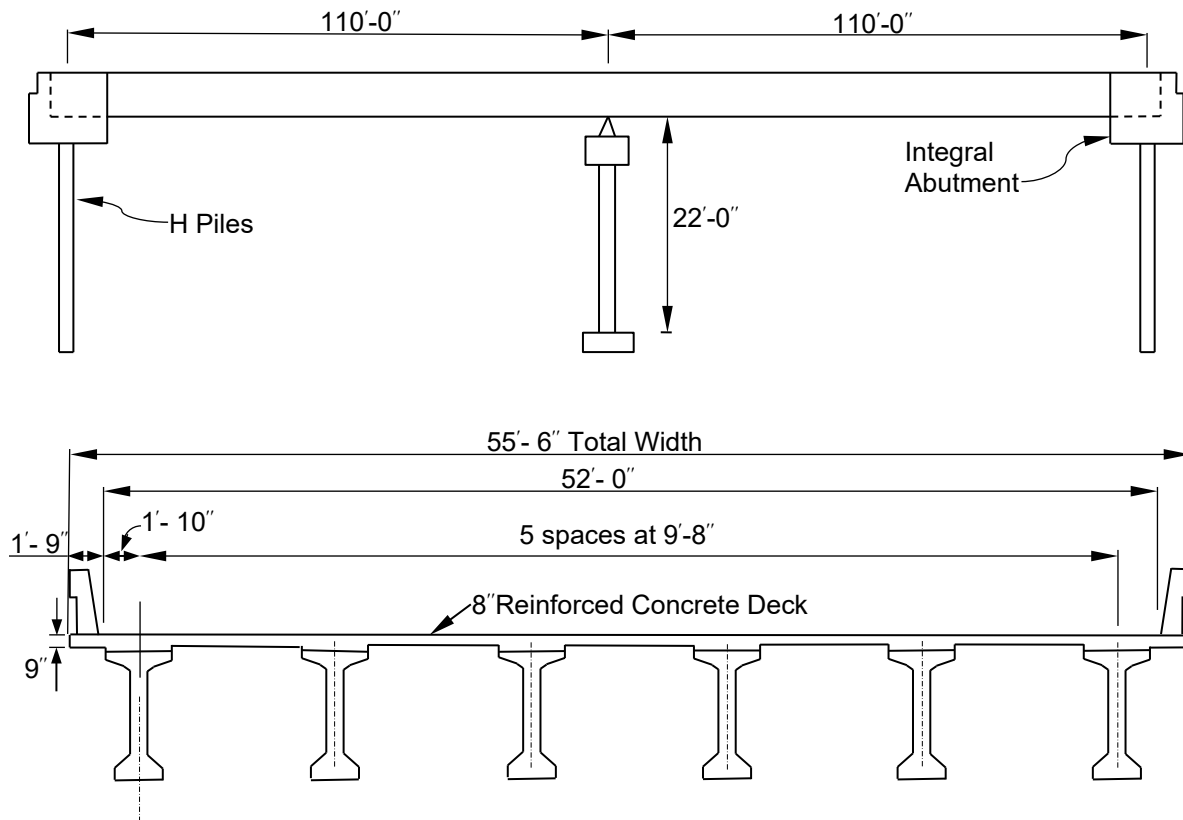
Precast Bulb-Tee Bridge to be Used for Distribution Calculations
